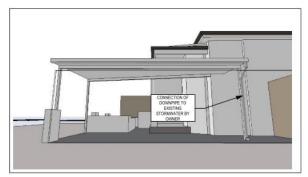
Architects impression of the reviewal application DA-96/2020/1 (Source - Australian Outdoor Living).
